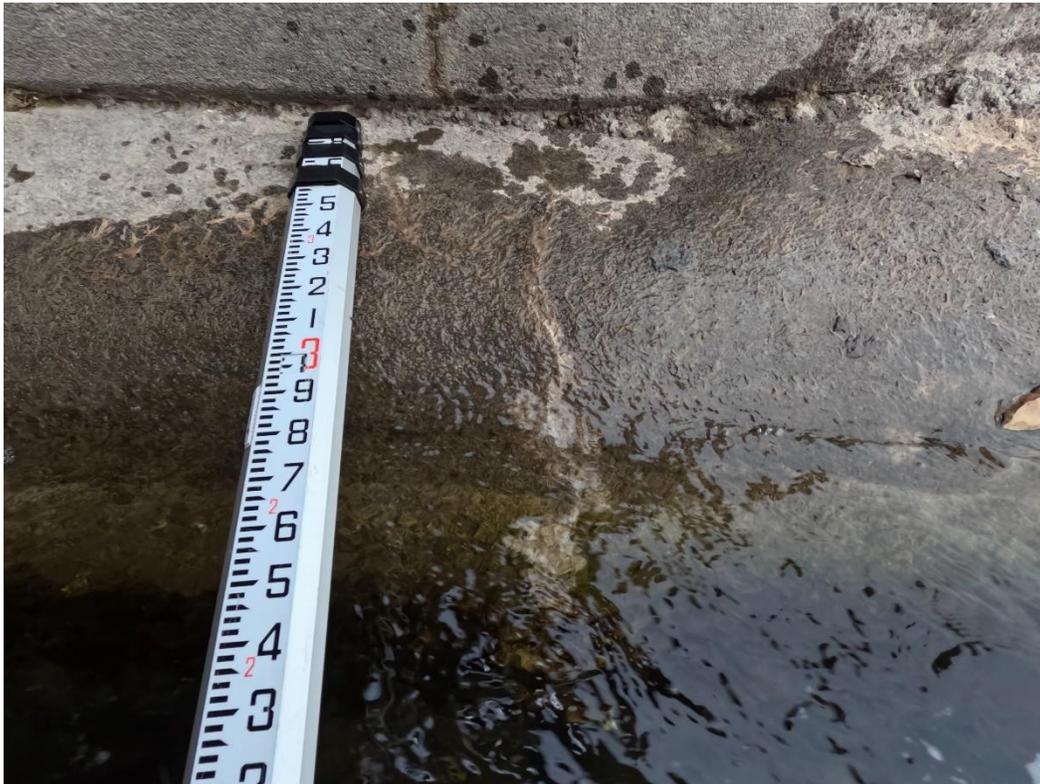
SOUTH PIER VERTICAL CRACK IN FOOTING LOOKING NORTH
